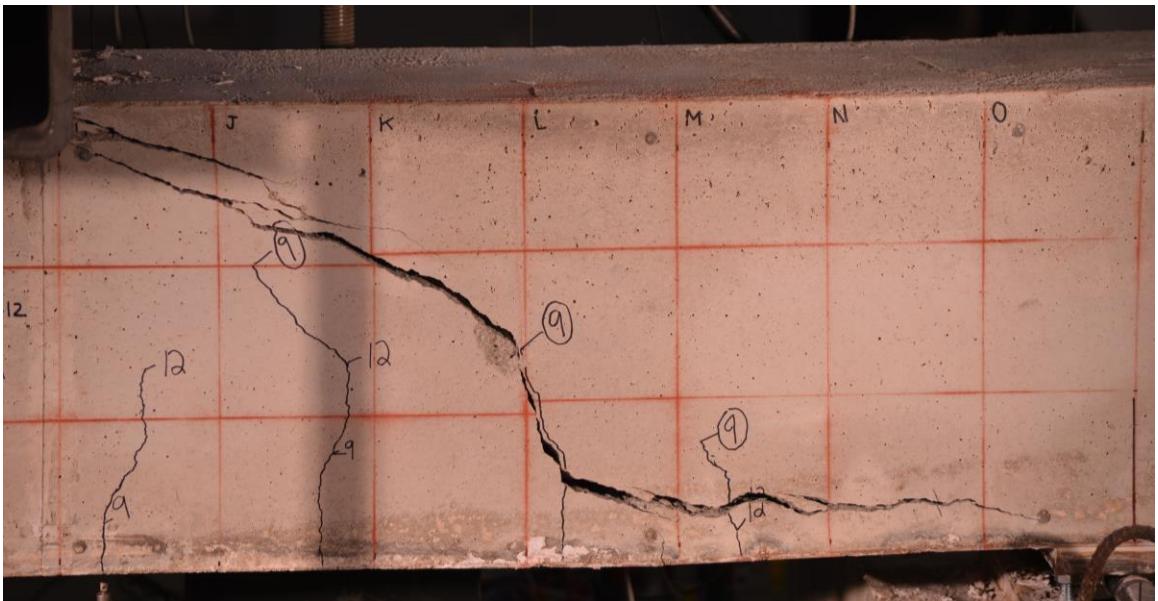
Specimen H-1: South Side Failure Inclined Crack
